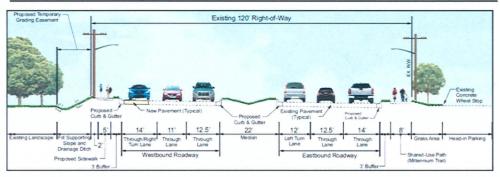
Alternative 2: Master Plan. Proposed typical roadway along East Gude Drive at Section A-A, approximately 1000' east of Calhoun Drive.
